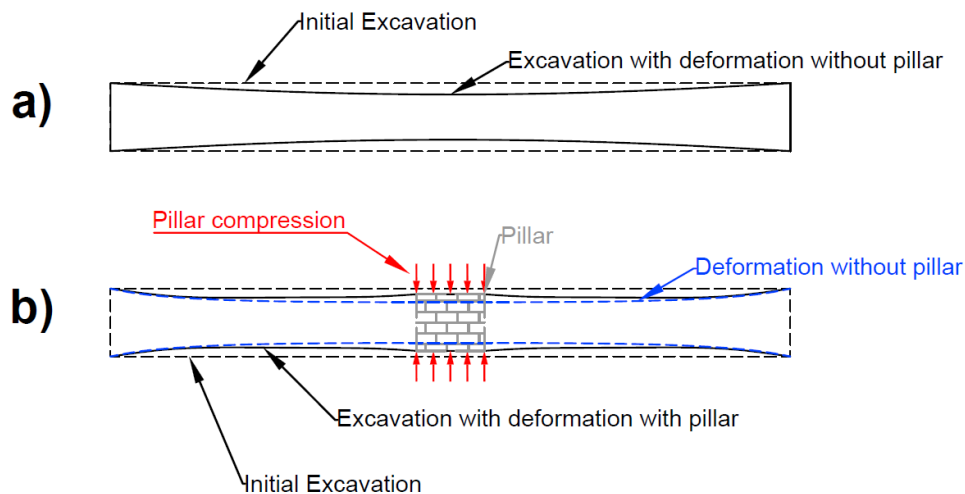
(a) elongated excavation with sketched deformed excavation boundaries (b) excavation with a pillar in the middle, which is loaded by the deforming excavation boundaries, and sketched changes of the deformations
